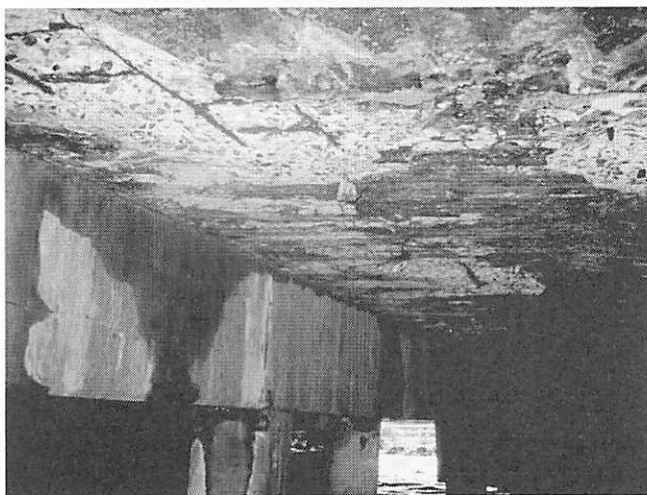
Corrosion of reinforcement observed at connection between slab and wall column
